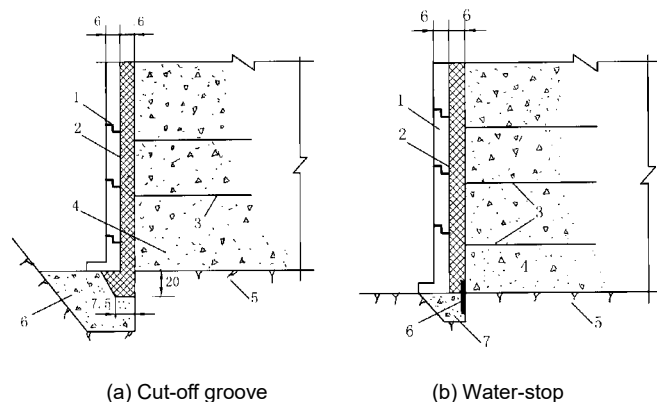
Connection of asphalt membrane and rock foundation. 1: Prefabricated reinforcement slabs; 2: asphalt membrane; 3: reinforcement bar; 4: concrete dam; 5: rock foundation; 6: concrete base or water-stop; 7: concrete base. Unit: cm.
